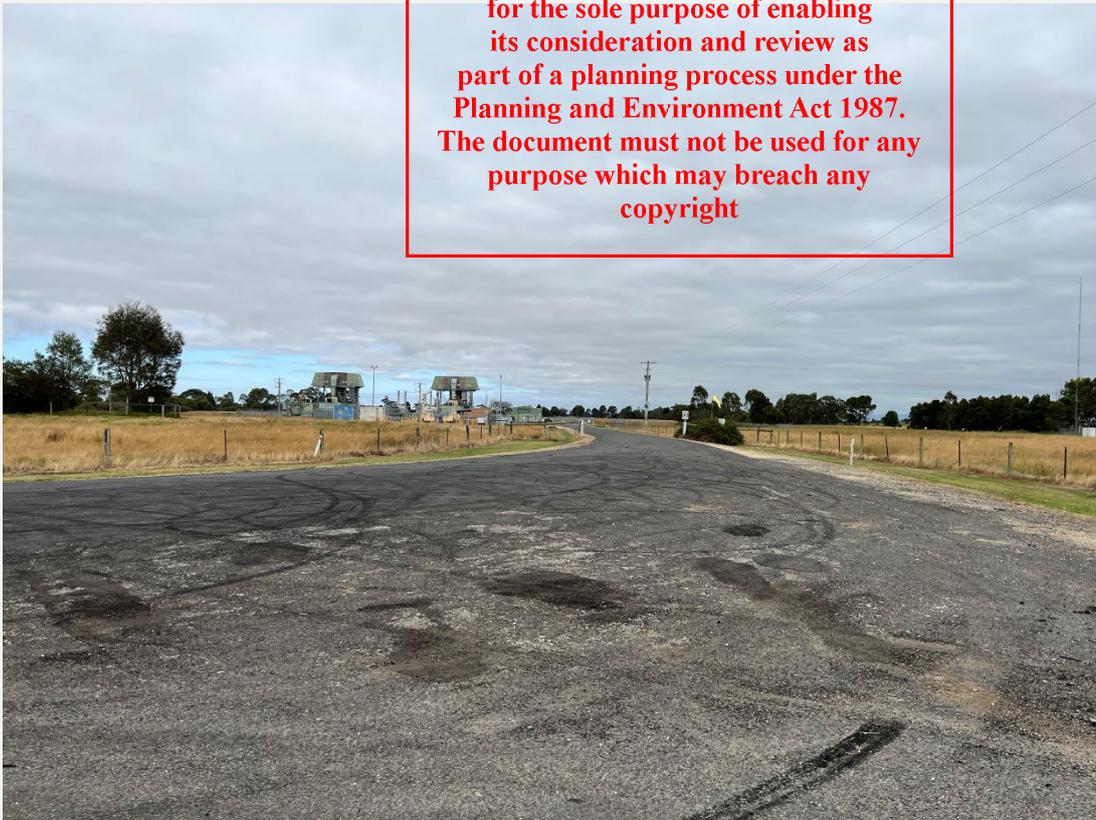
| Entry to Bairnsdale Power Station, looking west from Power Station Road
